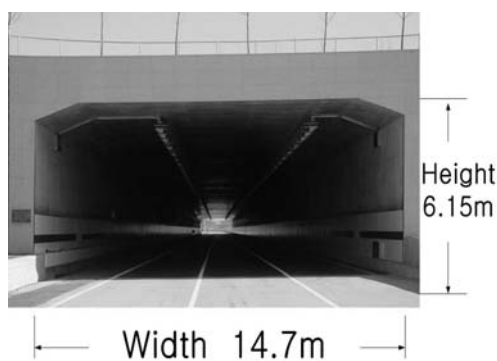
Cross-sectional view of Pyungtaek tunnel
